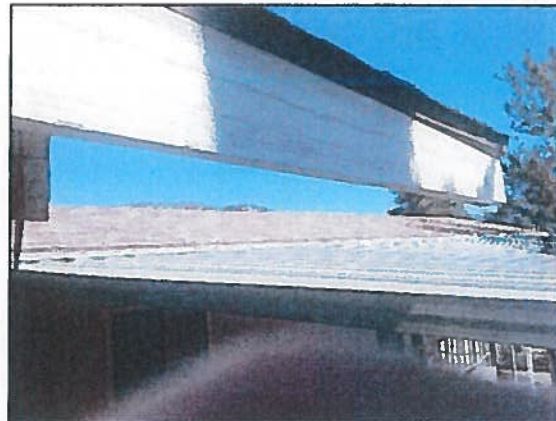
Fire Station 4 – Light cracking and weathering of fascia board on west side of garage
